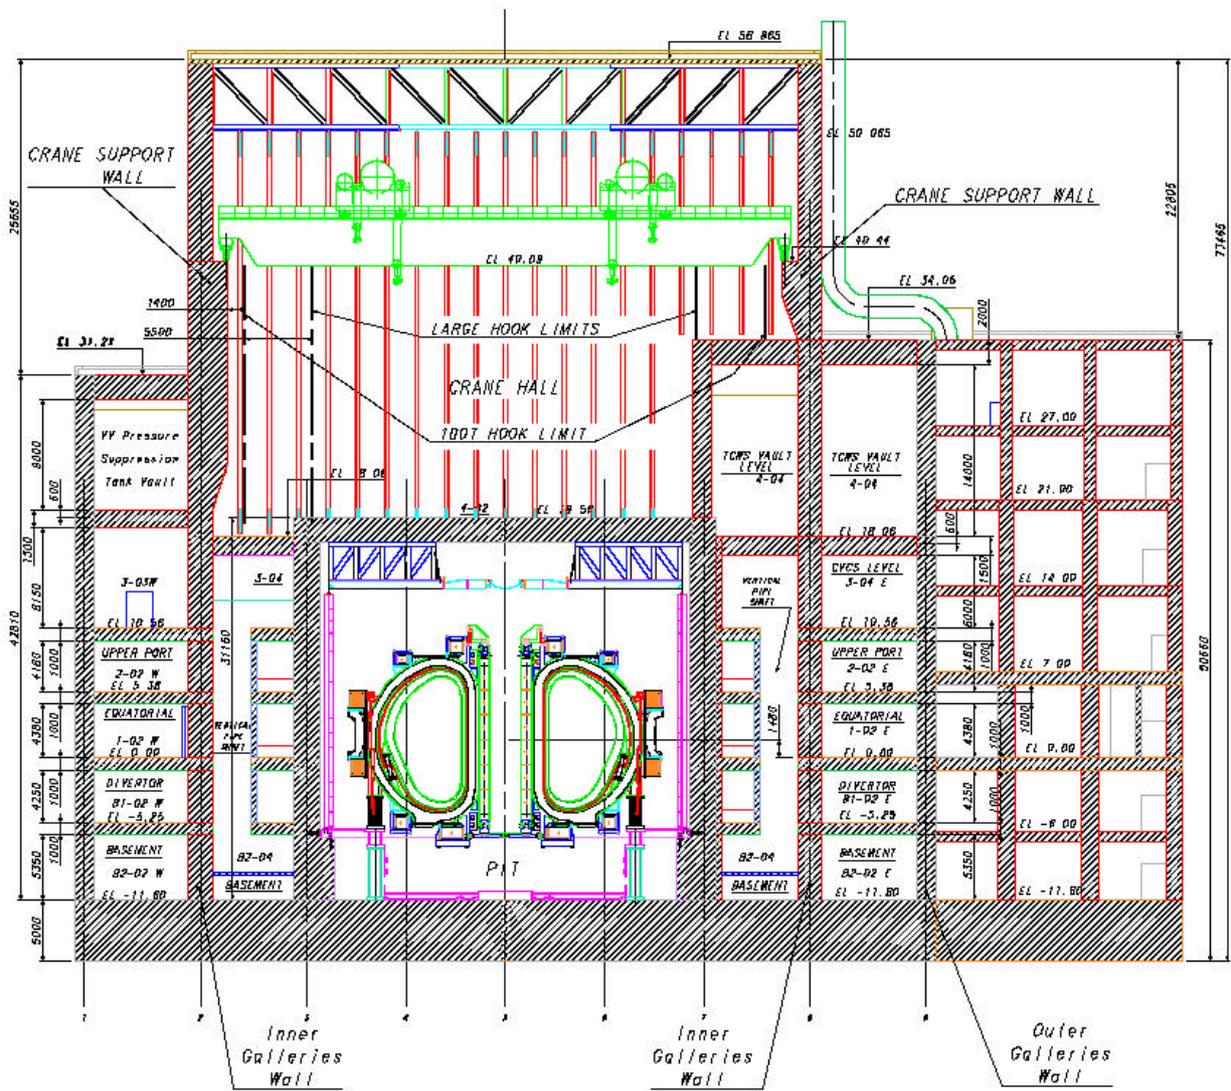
Tokamak Building Elevation (E-W Section)
